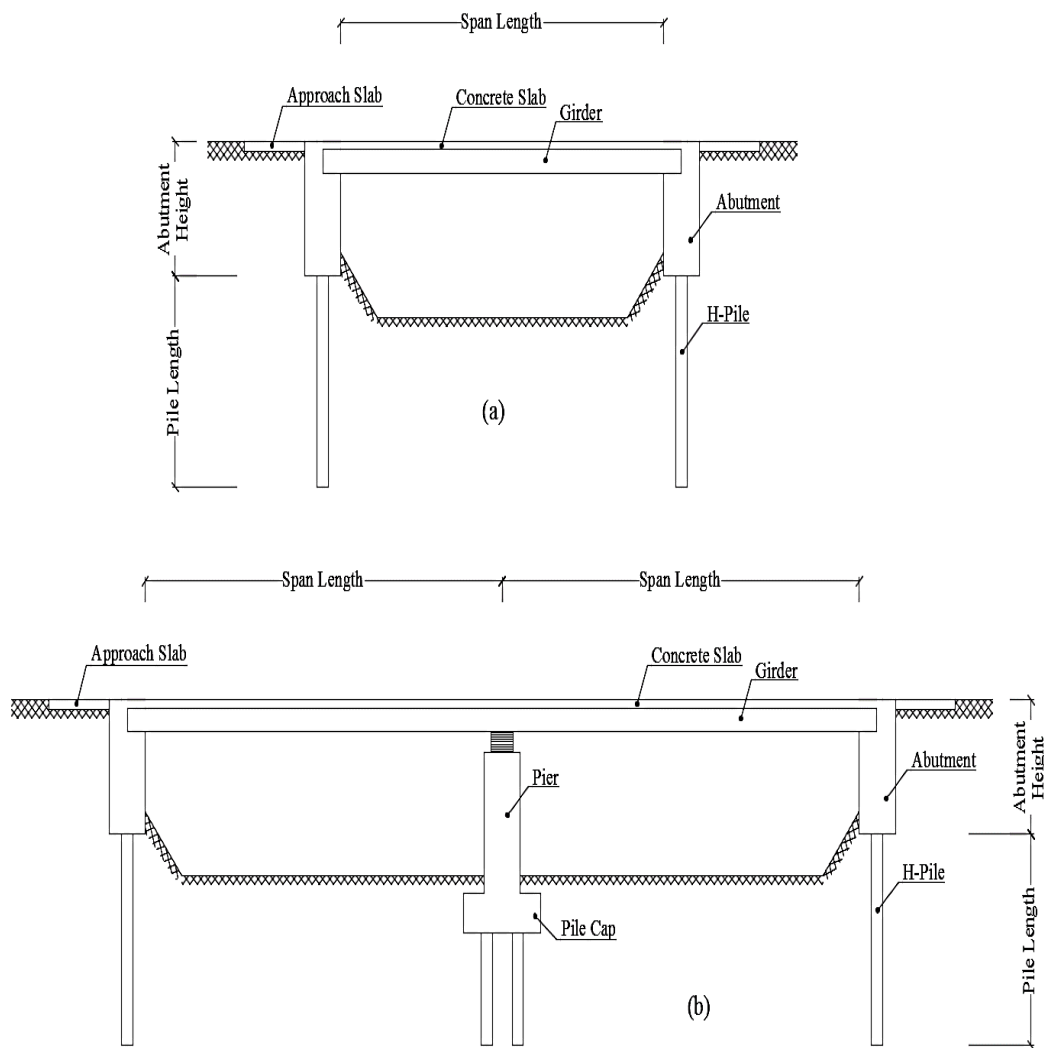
Archetypes layout (a) Single span bridge (b) Multi-span bridge
